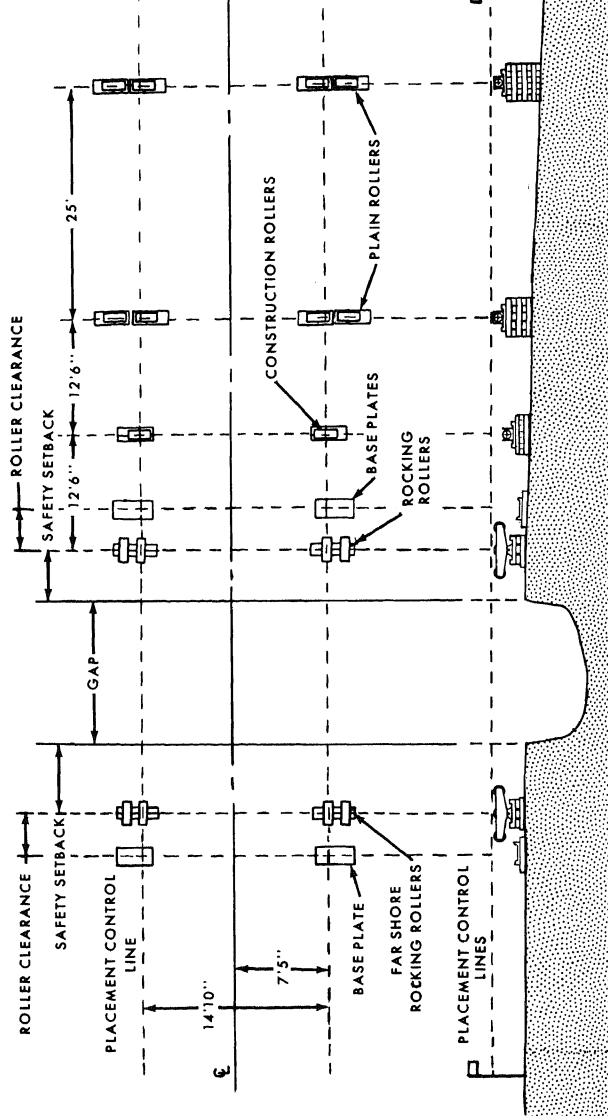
Plan and profile views of a typical roller layout for a triple-truss or multistory Bailey bridge.
